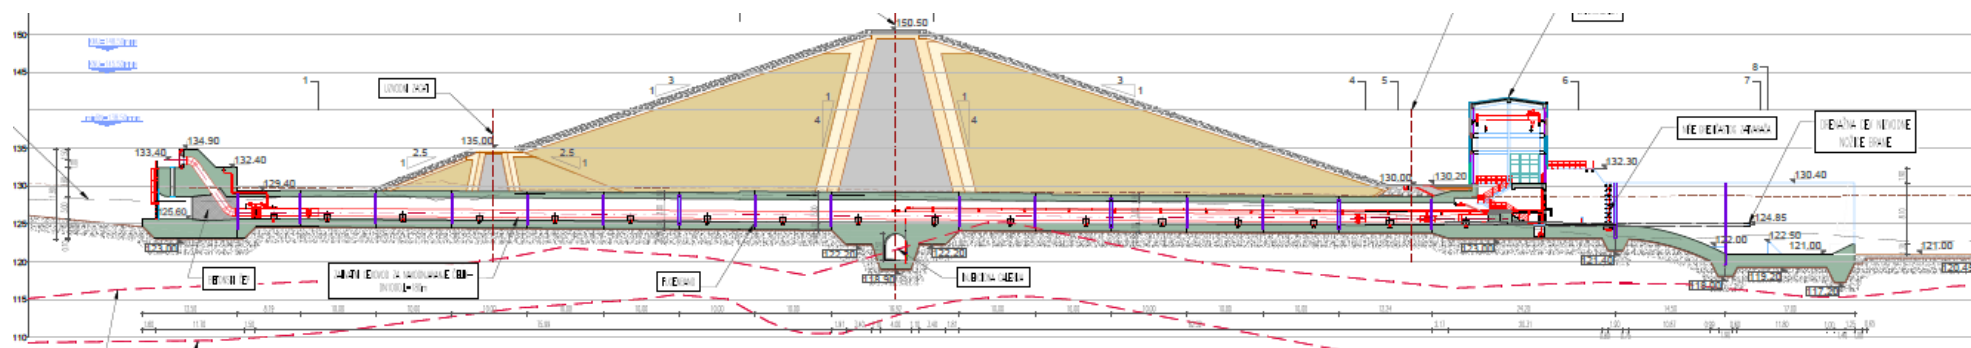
Cross section through the outlet facilities with an indication of environmental flow supplied via bottom outlet (A) and via irrigation pipe (B).
